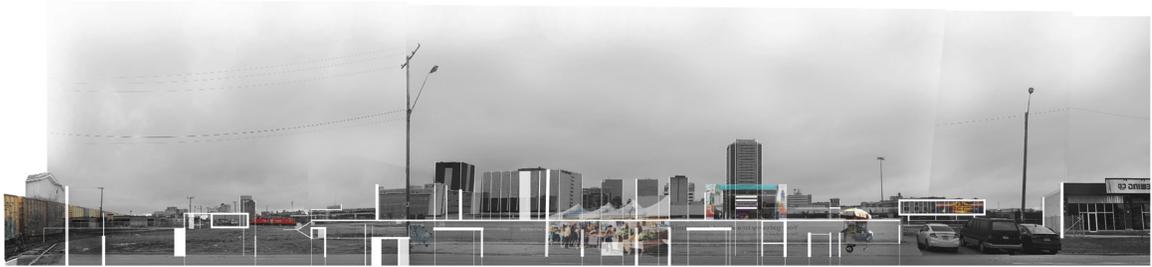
Extraction - Addition Plan & Section Sketch
